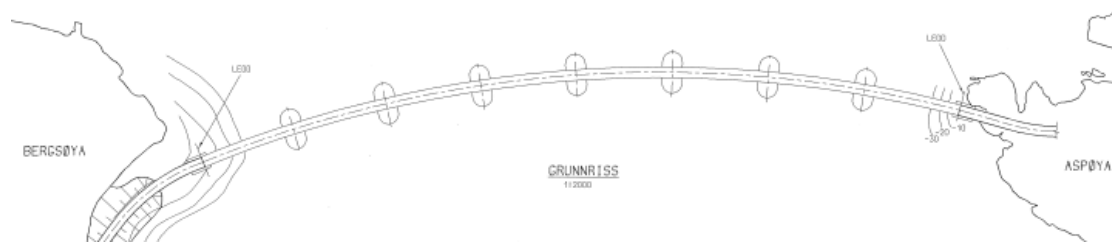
TOP VIEW OF THE BERGSØYSUND FLOATING BRIDGE [6]
